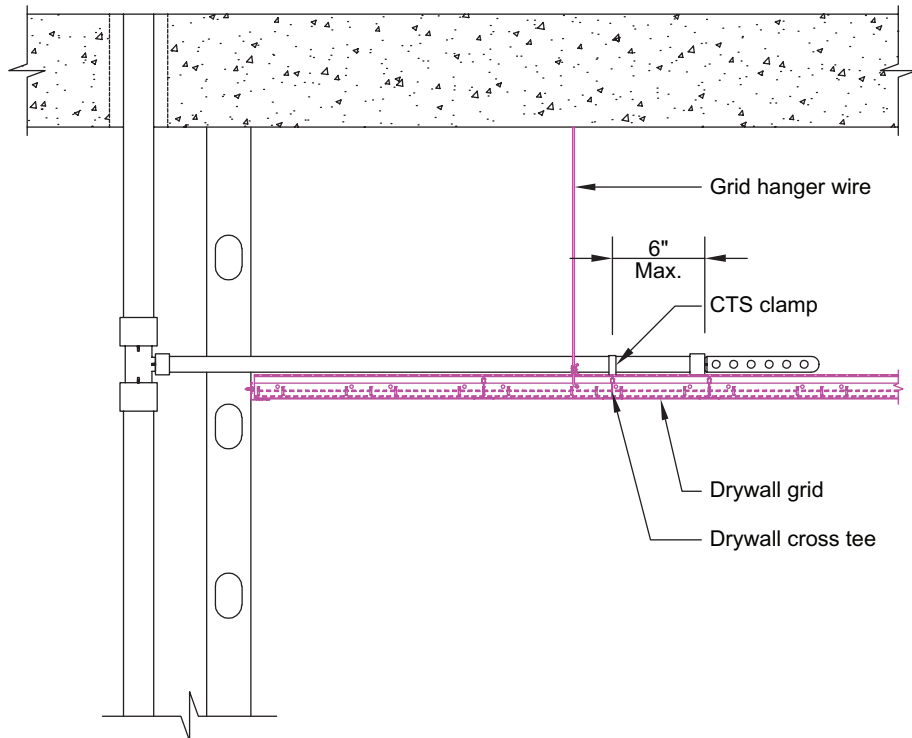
Supporting Multiport Tees on Drywall Grid
